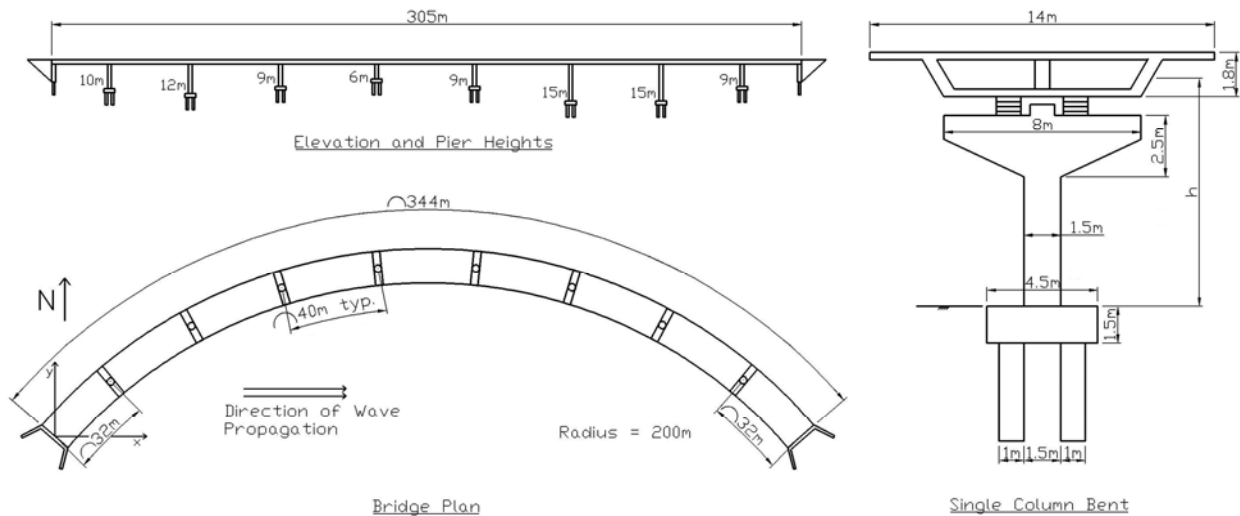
Study structure plan, elevation, and section (adapted from Priestley, 1994)
